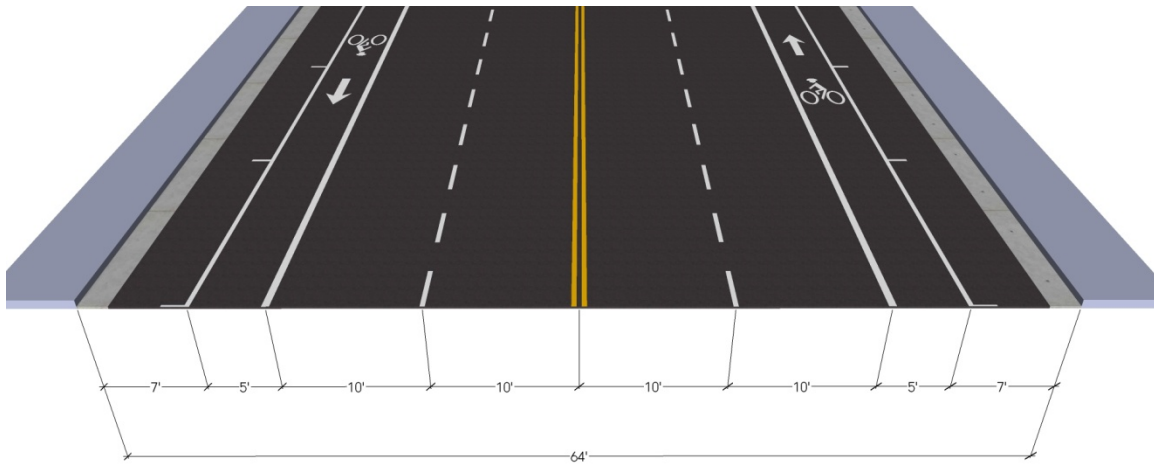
Cross section 64-1 – Most common cross section from PCH to Manhattan Beach Blvd.
